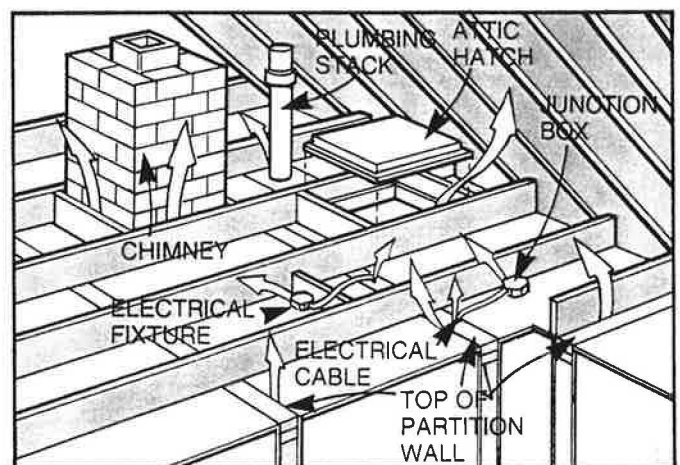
Bypasses (or spots where warm air can leak from the structure) occur along wire and pipe holes, around recessed lights, gaps in partition walls, and spaces around chimneys and attic hatch doors.
